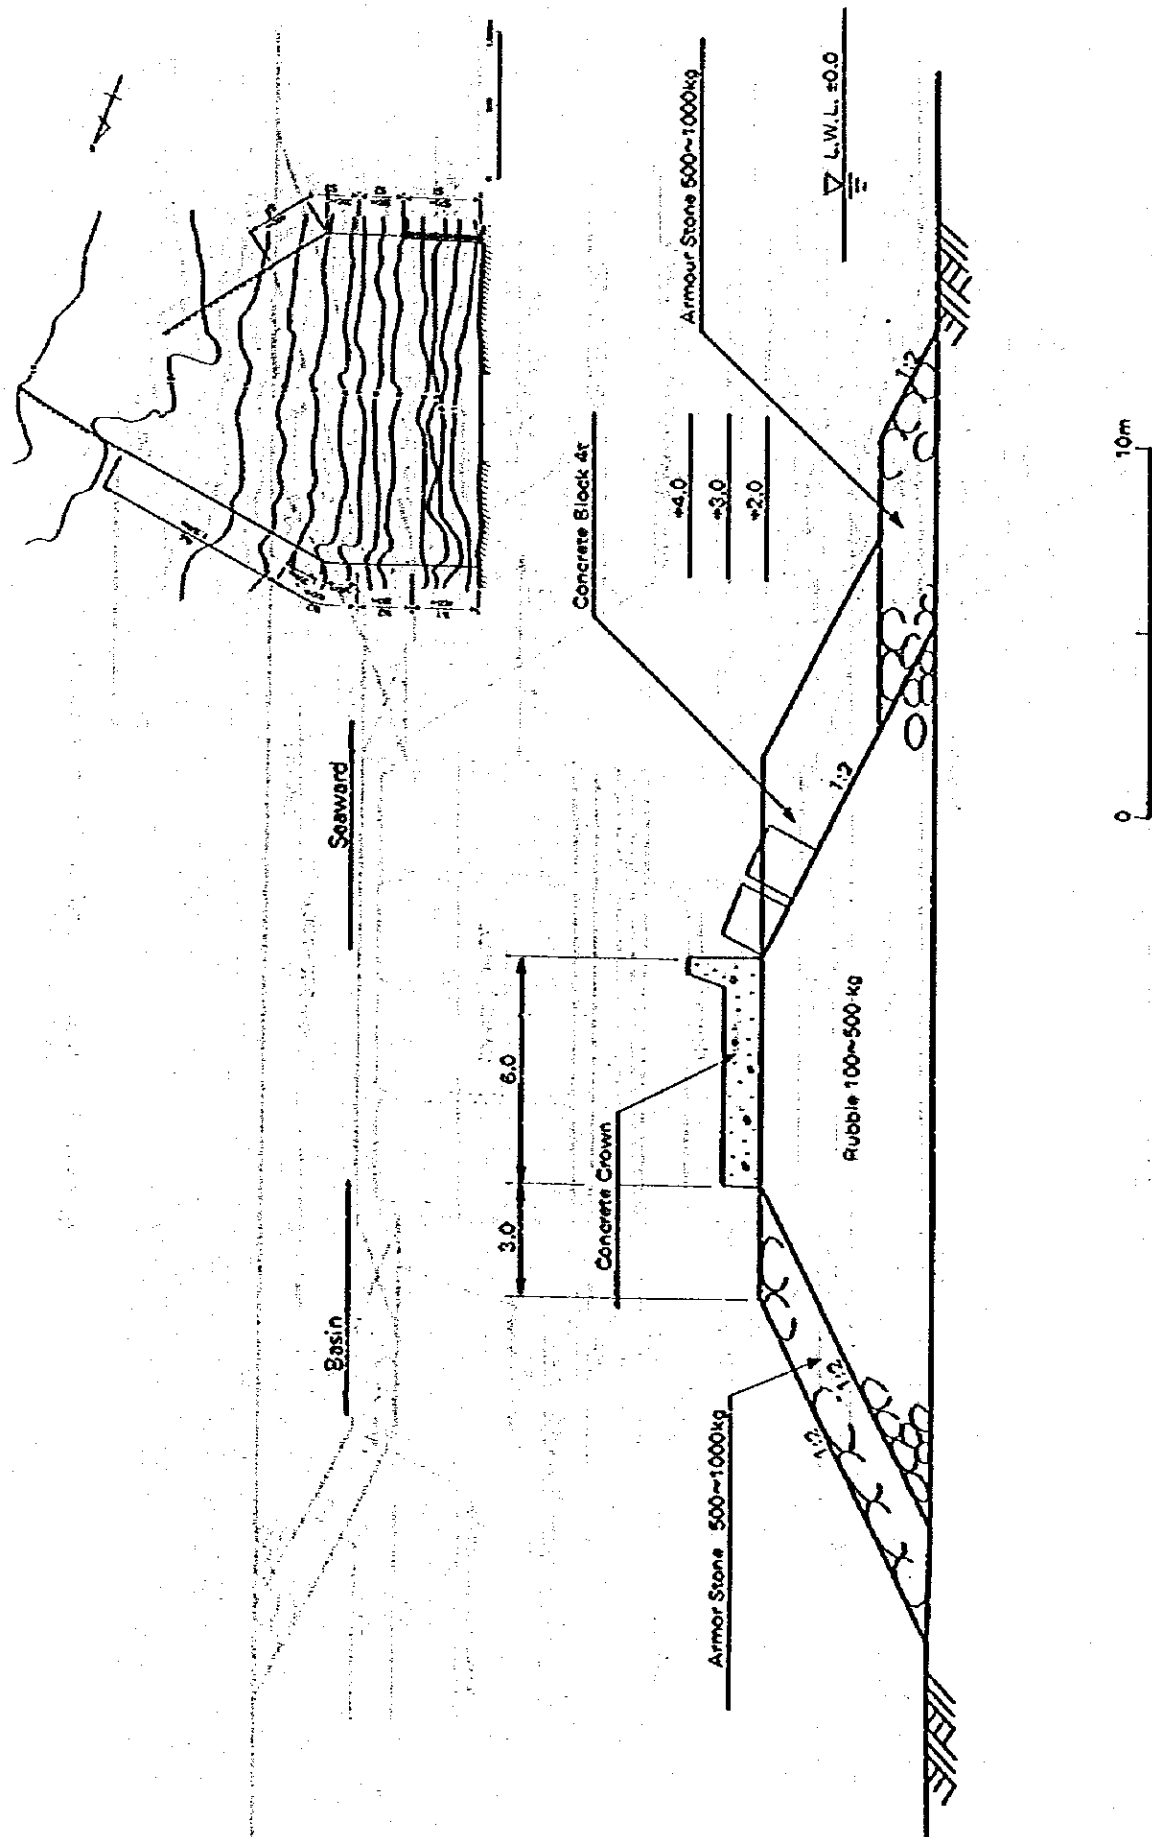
(6) Standard Crosssection of Breakwater (S1 Section)
